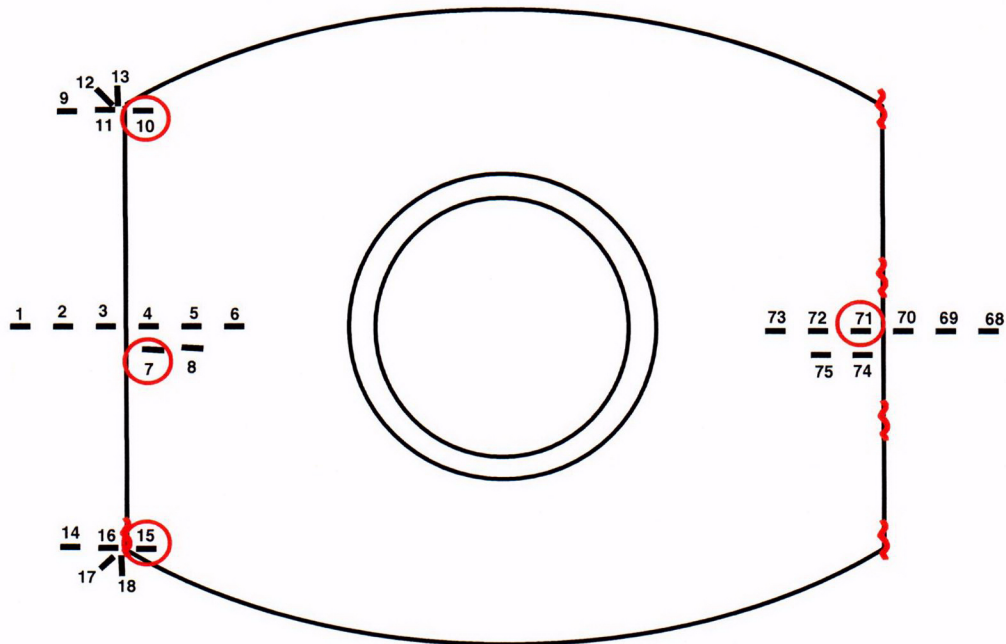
Equipment Hatch Liner Strain Gage Layout (Inside View)
